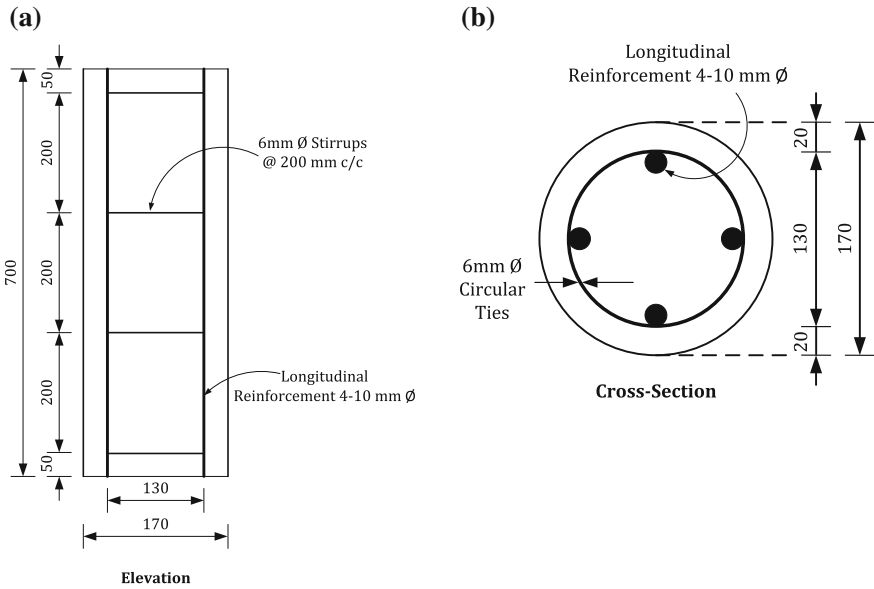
Reinforcement details of circular specimen a elevation, b cross section
